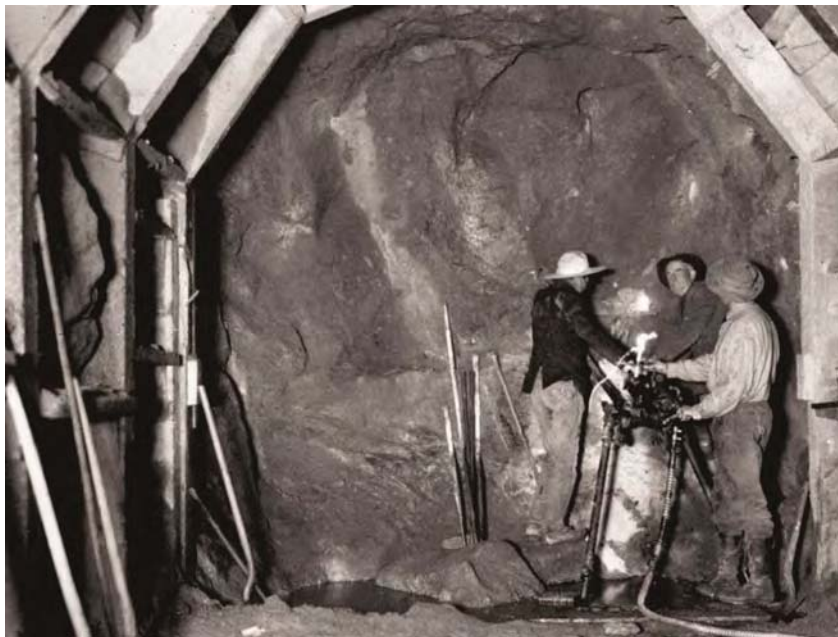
Elizabeth Tunnel construction in 1908 showing timber sets and lagging. Source: Department of Water and Power archives; used with permission.
